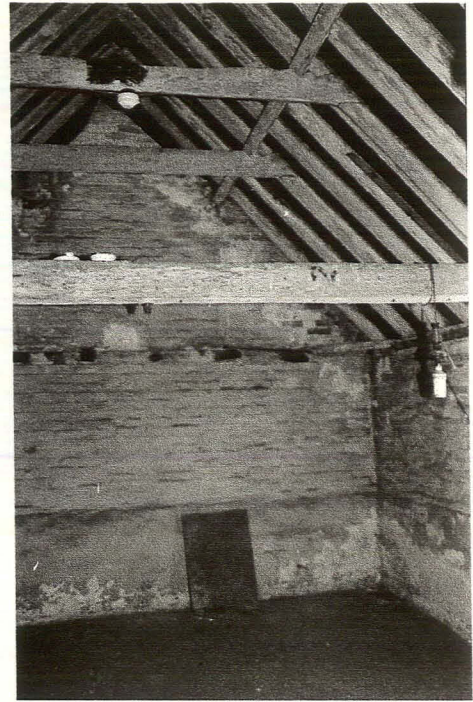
East End Store Room, North Wing, Upper Floor North Wall, showing Projecting Posts, looking north
